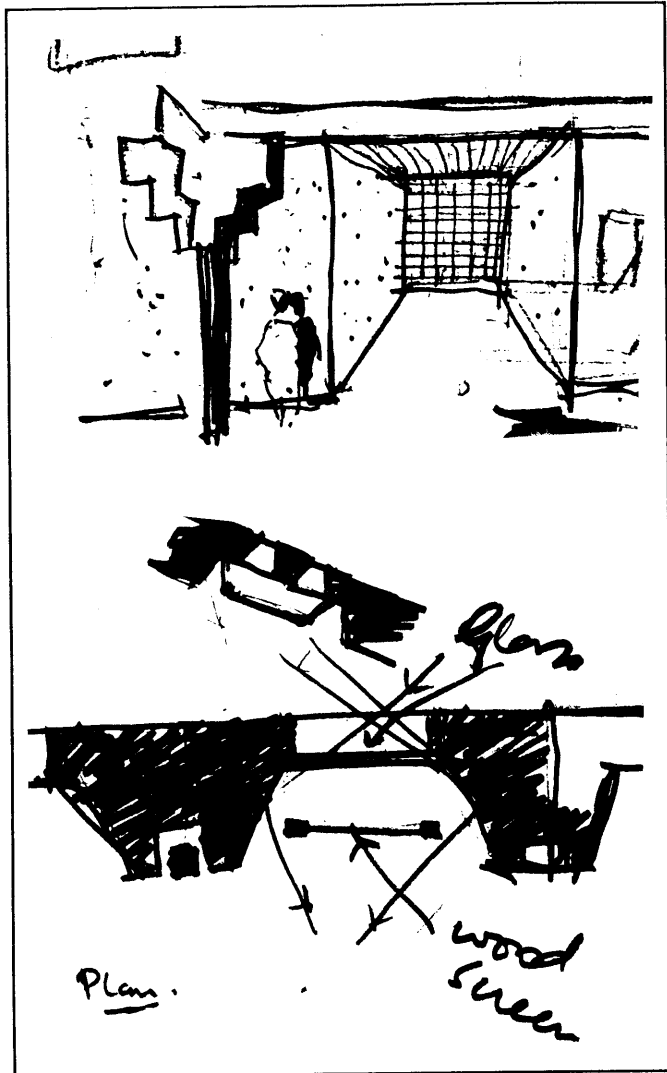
Prayer hall wall from inside more defined. Integration of structure, light and decorative elements.
